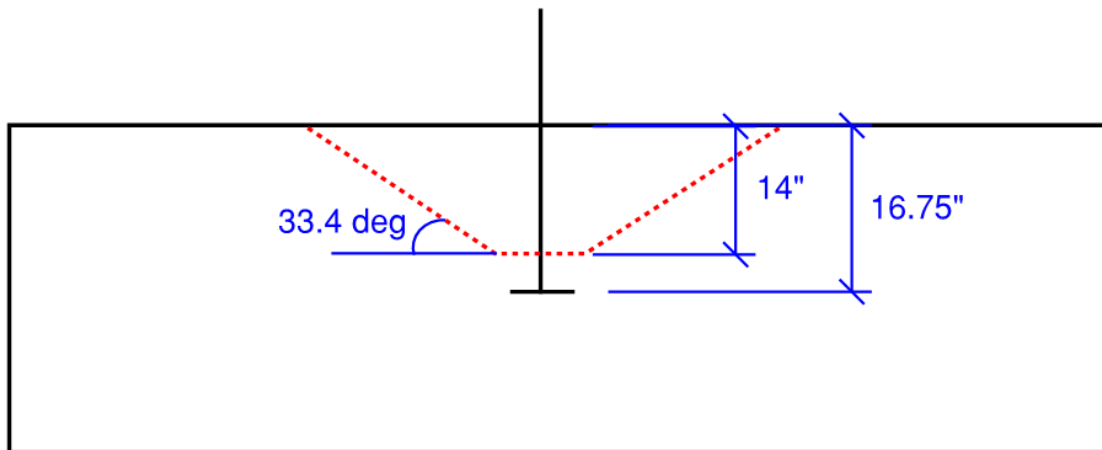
Damage in the concrete beam of Specimen 1
